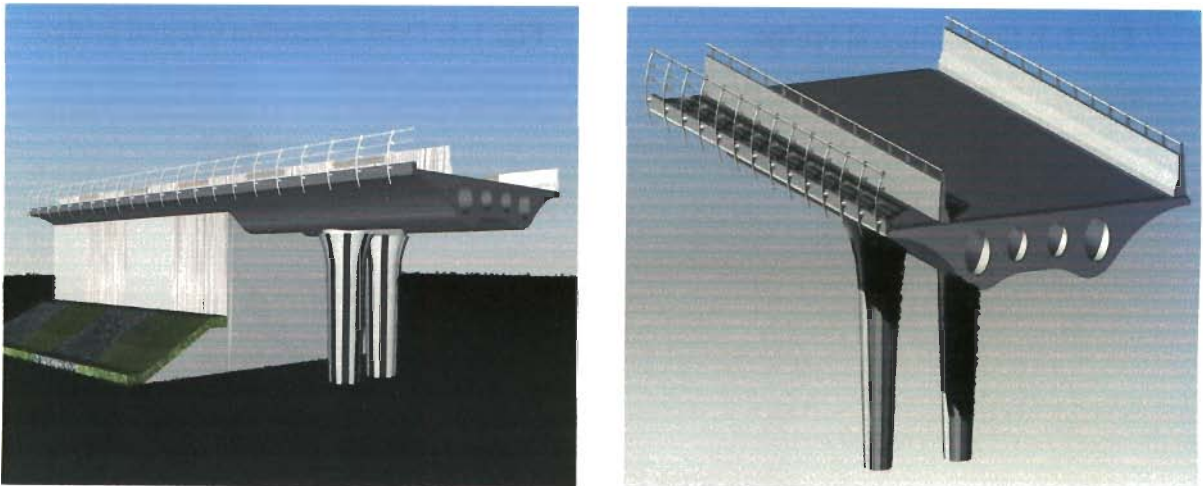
Cast-in-situ piers integral with voided deck slab - used in Kalkaiji Flyover (Courtesy-Tandon Consultants Pvt. Ltd.)
